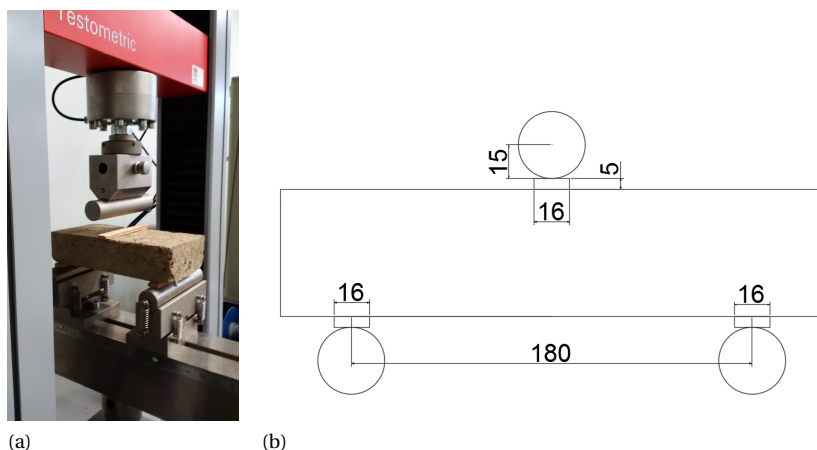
Three point bending test setup with indication of geometrical dimensions in mm (b)
